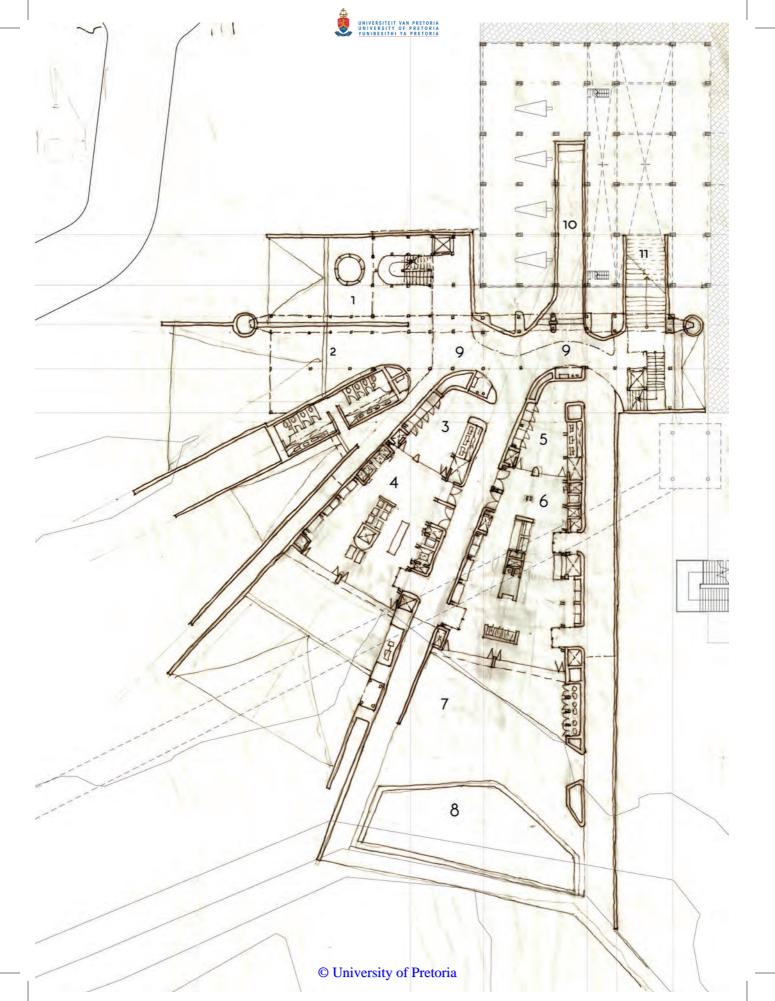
to 6.59 show the refinement of the design after the above mentioned presentation. The issue of the building having a domestic scale was addressed by raising the ceiling heights of the spaces, so that the new levels relate to the existing levels in the washer plant (Figure 6.55). This served to make the spaces less cramped and also to create a stronger relationship between old and new.
